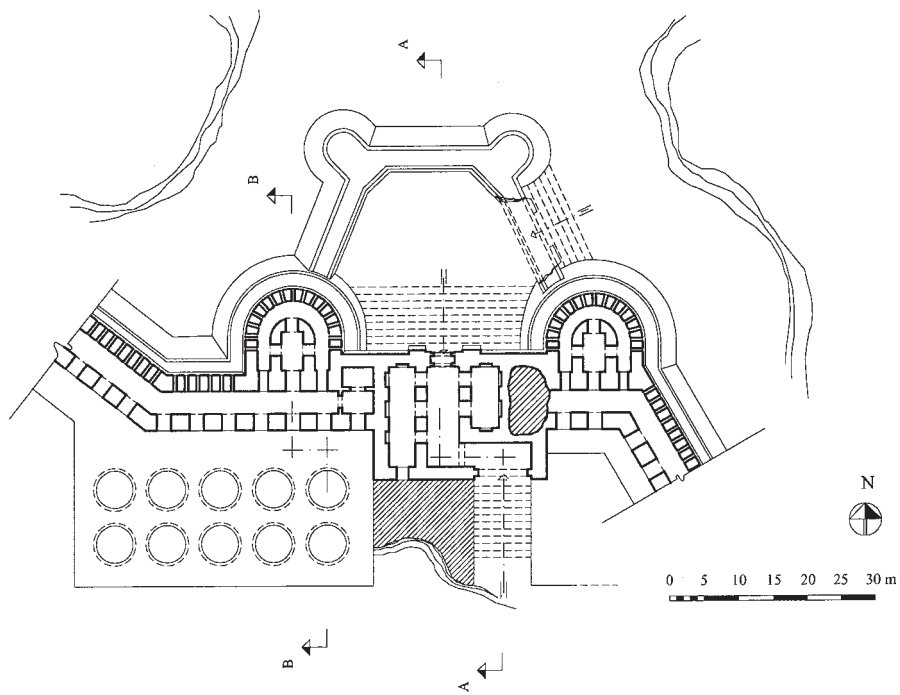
The North Gate, plan of Level 2, showing the gatehouse, and its flanking towers, the fortification walls and the roof level of the silos.
